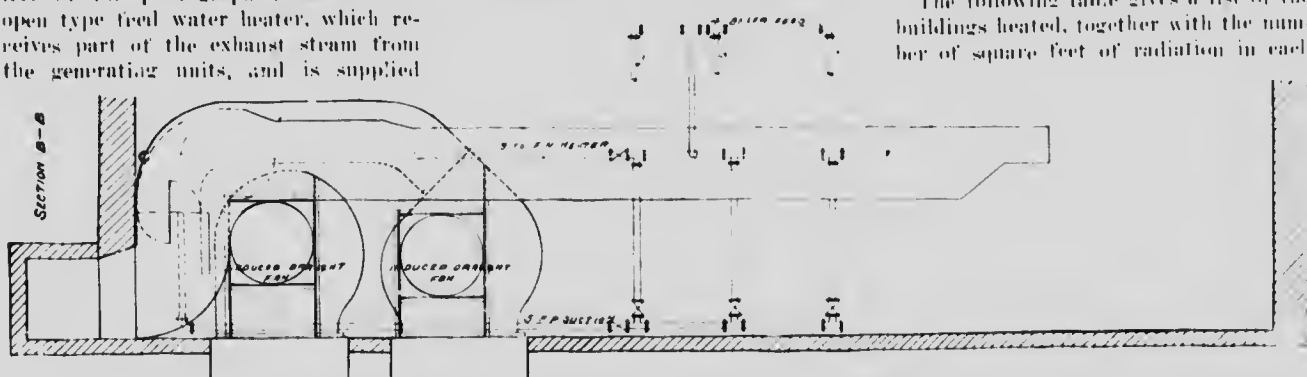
ELEVATION OF INDUCED DRAUGHT EQUIPMENT SHOWING SMOKE BREACHING, FAN CASINGS AND SECTION OF SMOKE TUNNEL.
